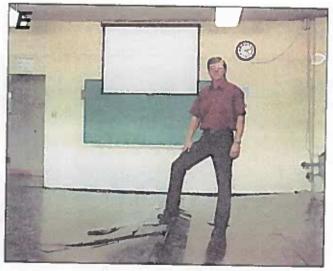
E*, The wood flooring in a school in Montrose has buckled because of compression due to settlement of the underlying concrete slabon-grade. Photo courtesy of Tom Griepentrog, Buckhorn Geotech.
